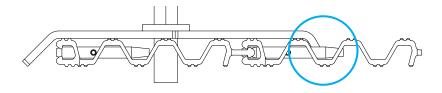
Leading Edge Anchor Plate placed into groove of C40 / C90 Trackway®
